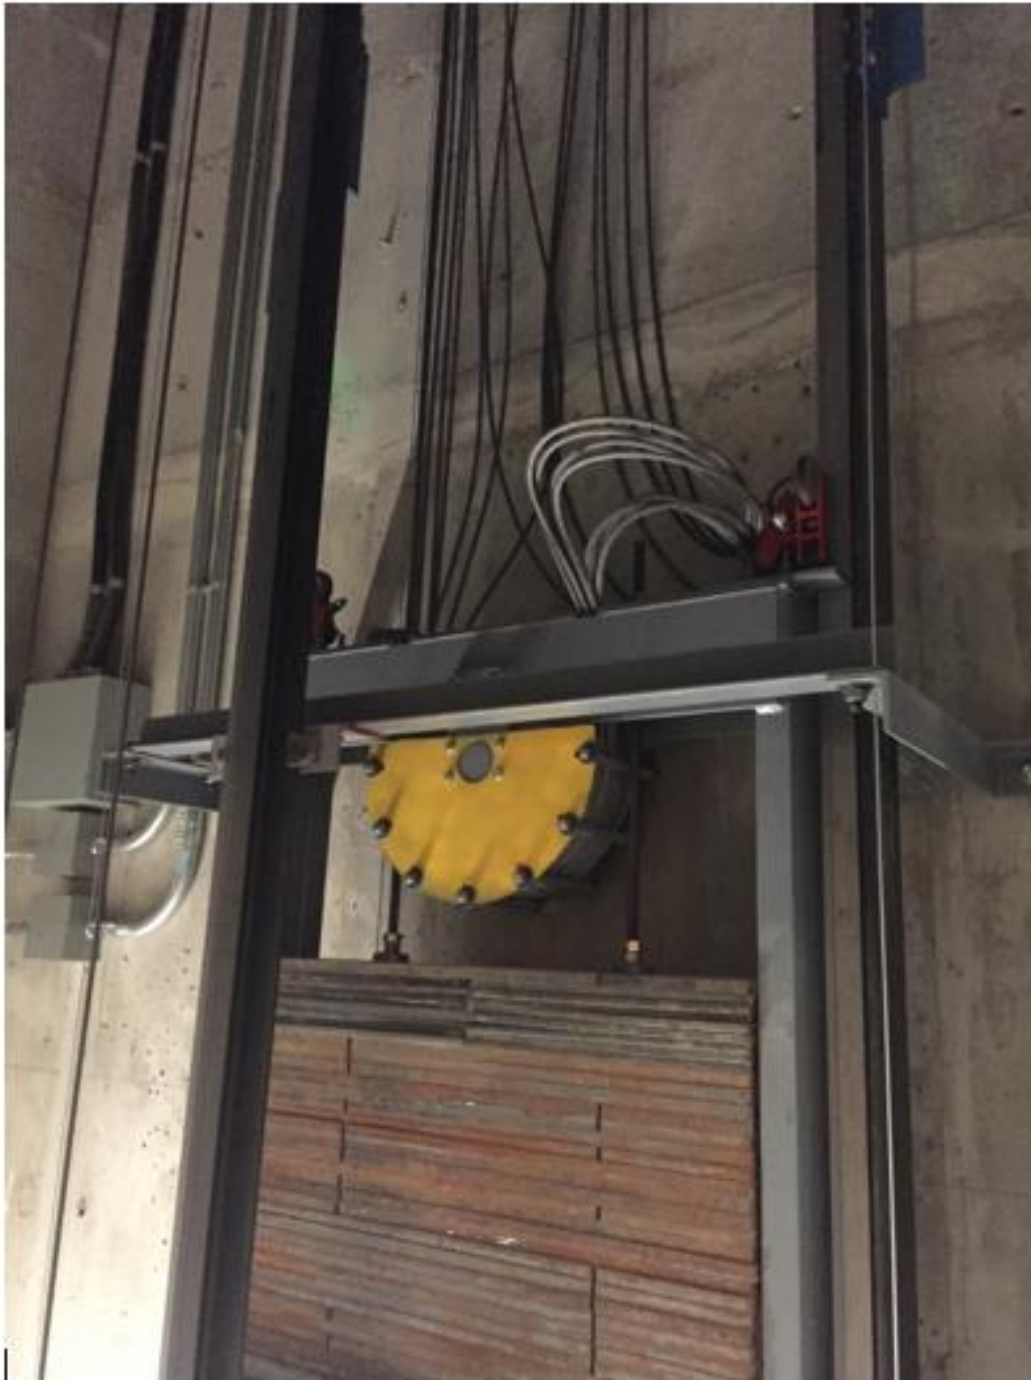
Picture of counterweight resting on buffers with slacked cables.
